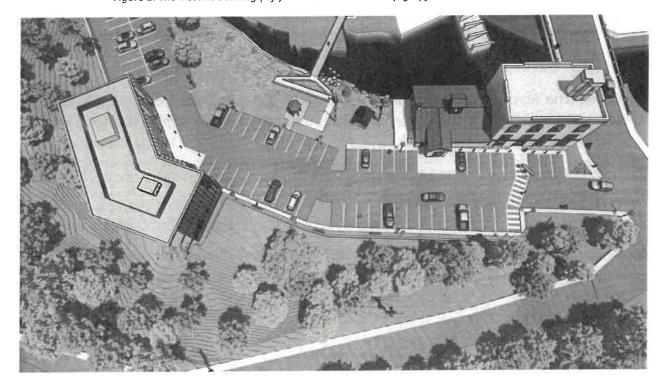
Overhead view of the project area, including the new construction (left) and redesigned parking area with 60-70 spaces.
